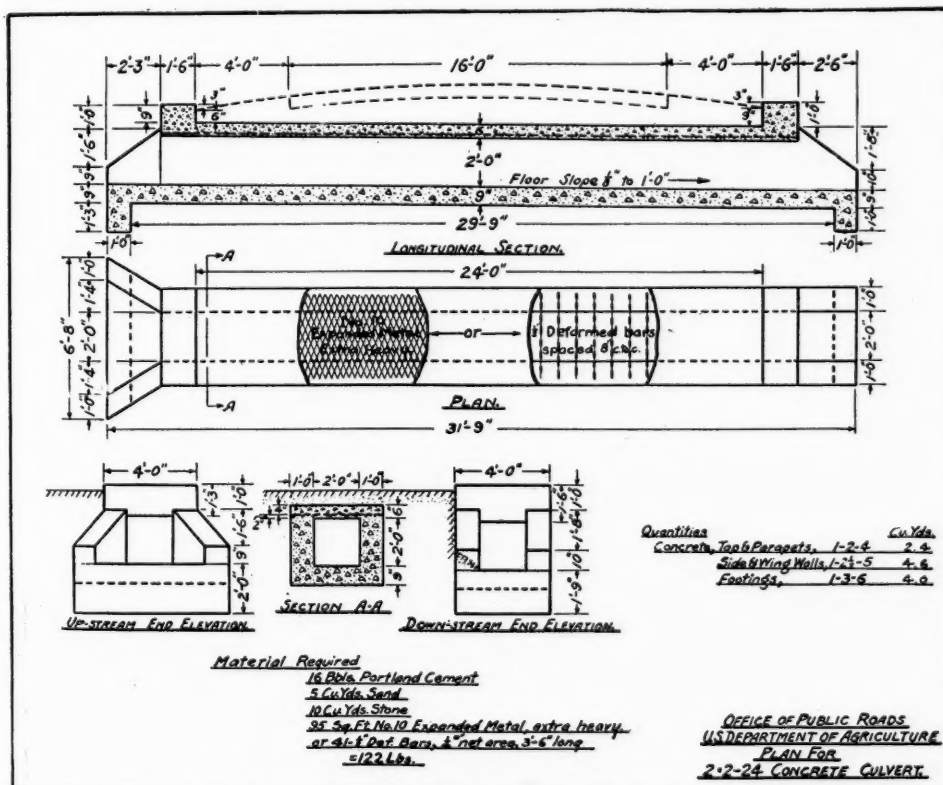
PLAN FOR A CONCRETE BOX CULVERT.
